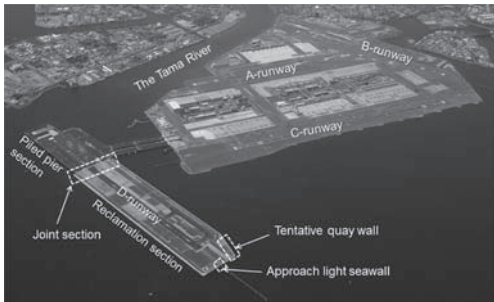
The D-runway and previous airport facilities of the Tokyo Haneda Airport.
